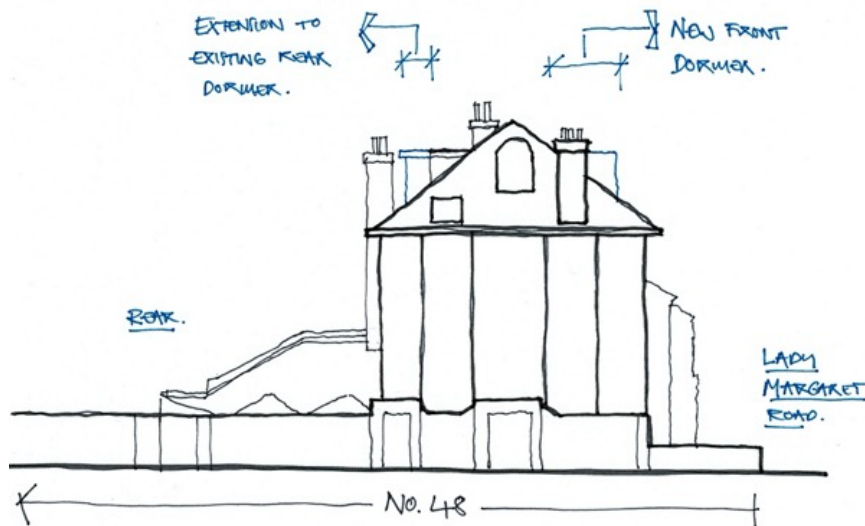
The sketch above, side elevation along Ospringe Road indicates the additions we seek approval for.
